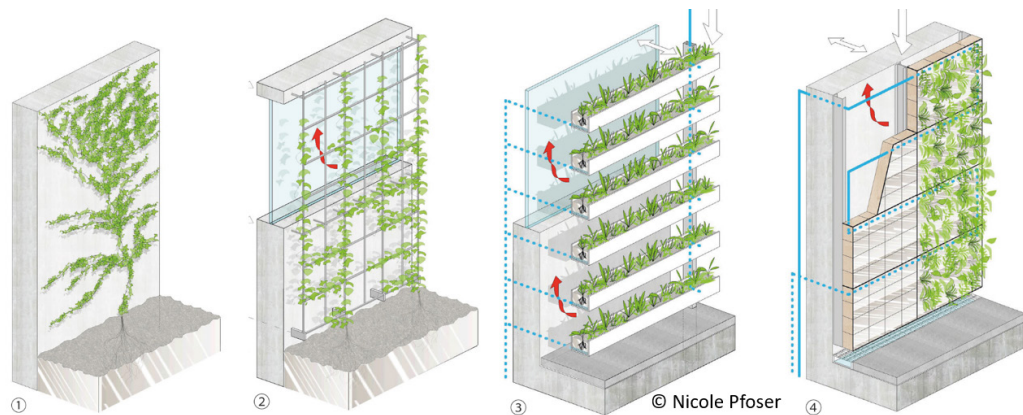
Different vertical green systems: 1) ground-based; 2) overgrown rope façades; 3) balcony boxes system; 4) living wall. (Pfoser, 2016, p. 126/127, fig. 137) & (Pfoser, 2018, p. 166-167)
